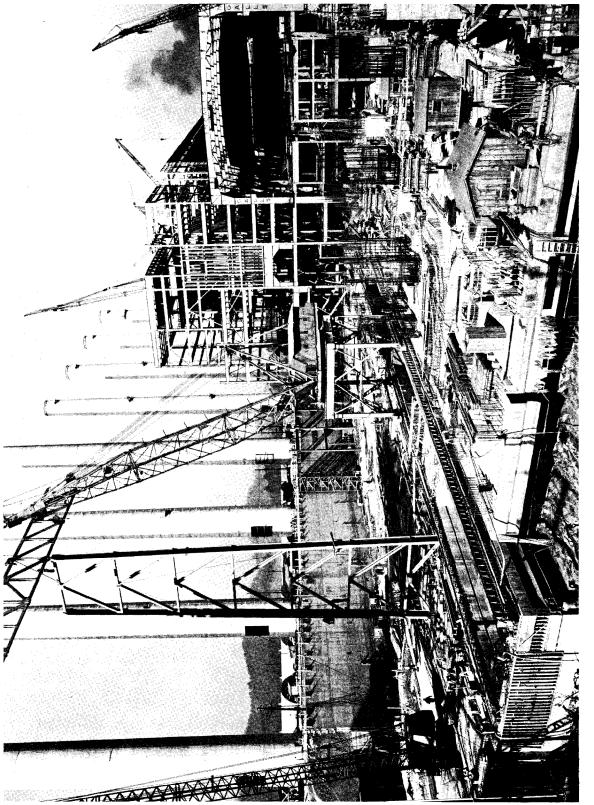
Construction of the powerhouse November 16, 1963. Erecting steel for unit 5 in background and construction of the substructure for unit 9 in foreground. Construction of turbogenerator foundations at right. Steel erection at top of picture for conveyor bridge BC-5 and 6.
